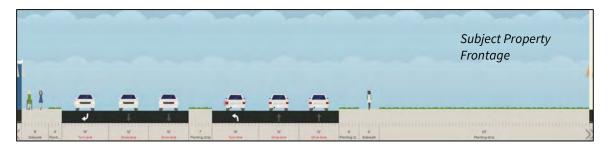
Existing 170 ft. Right-of-Way for Century Boulevard Looking North
